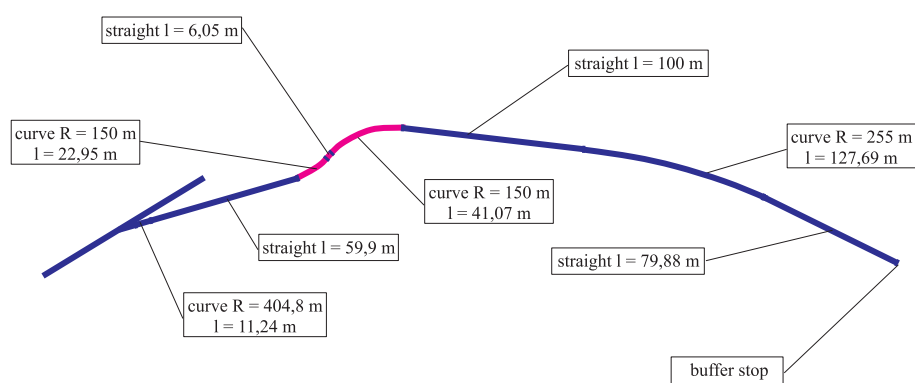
Track layout of the S-shaped track [A. Zbieć]
